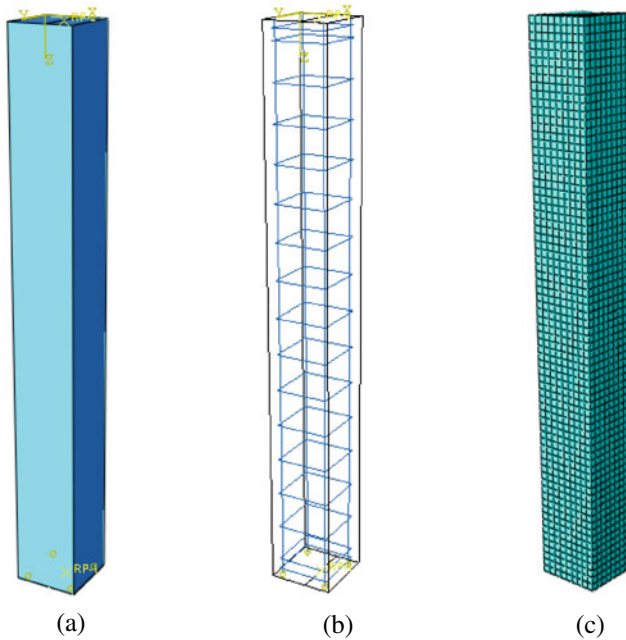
Modelling of reinforced geopolymer concrete column a geometry, b steel reinforcement, c Finite element meshing
